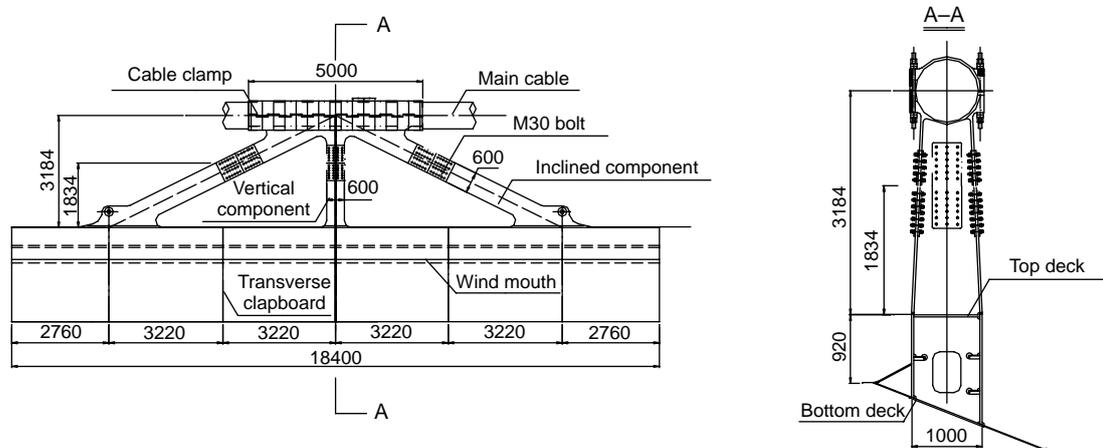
Diagram of central buckle of the Taizhou Bridge (unit: mm)
